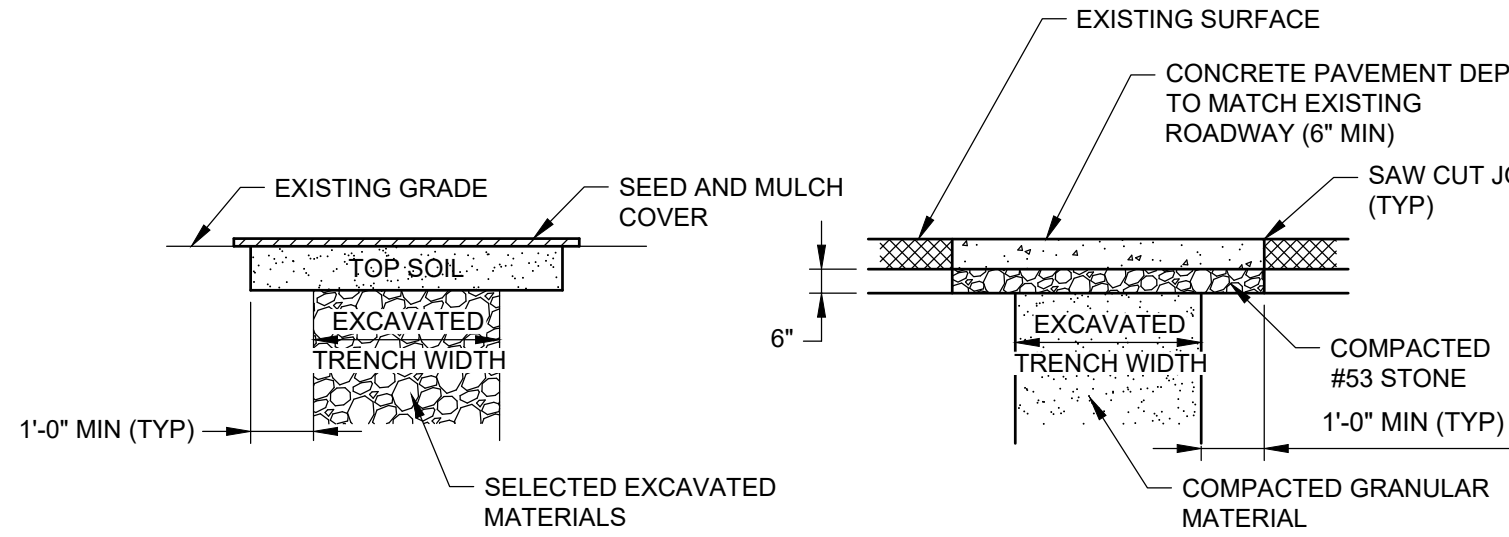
/C14 - TYPICAL ROAD SECTION
